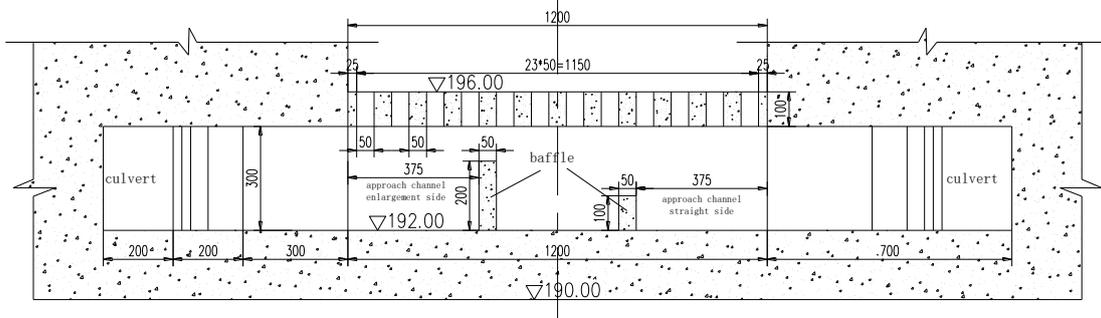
Layout of in-chamber bottom longitudinal culvert with manifolds (Unit: Elevation m, Length cm)
